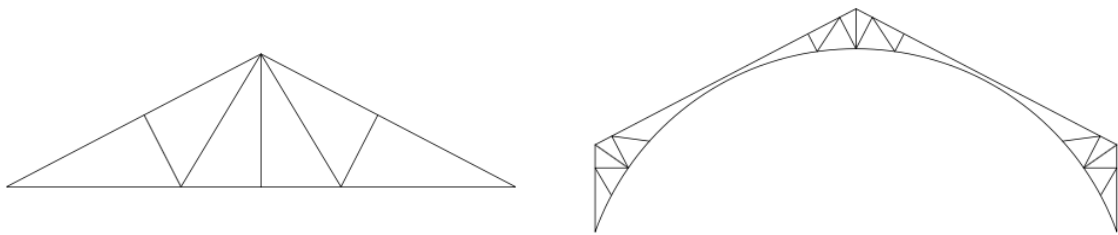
Indicative Polonceau truss (left) and Ardant truss (right)
